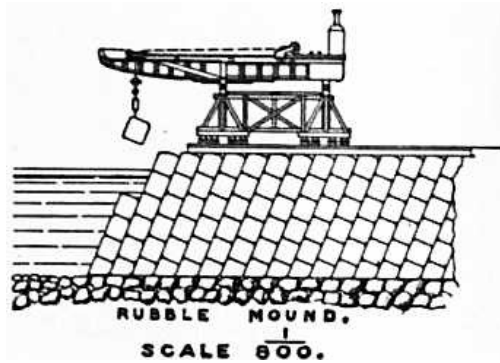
Colombo North-West Breakwater with Titan Crane.
